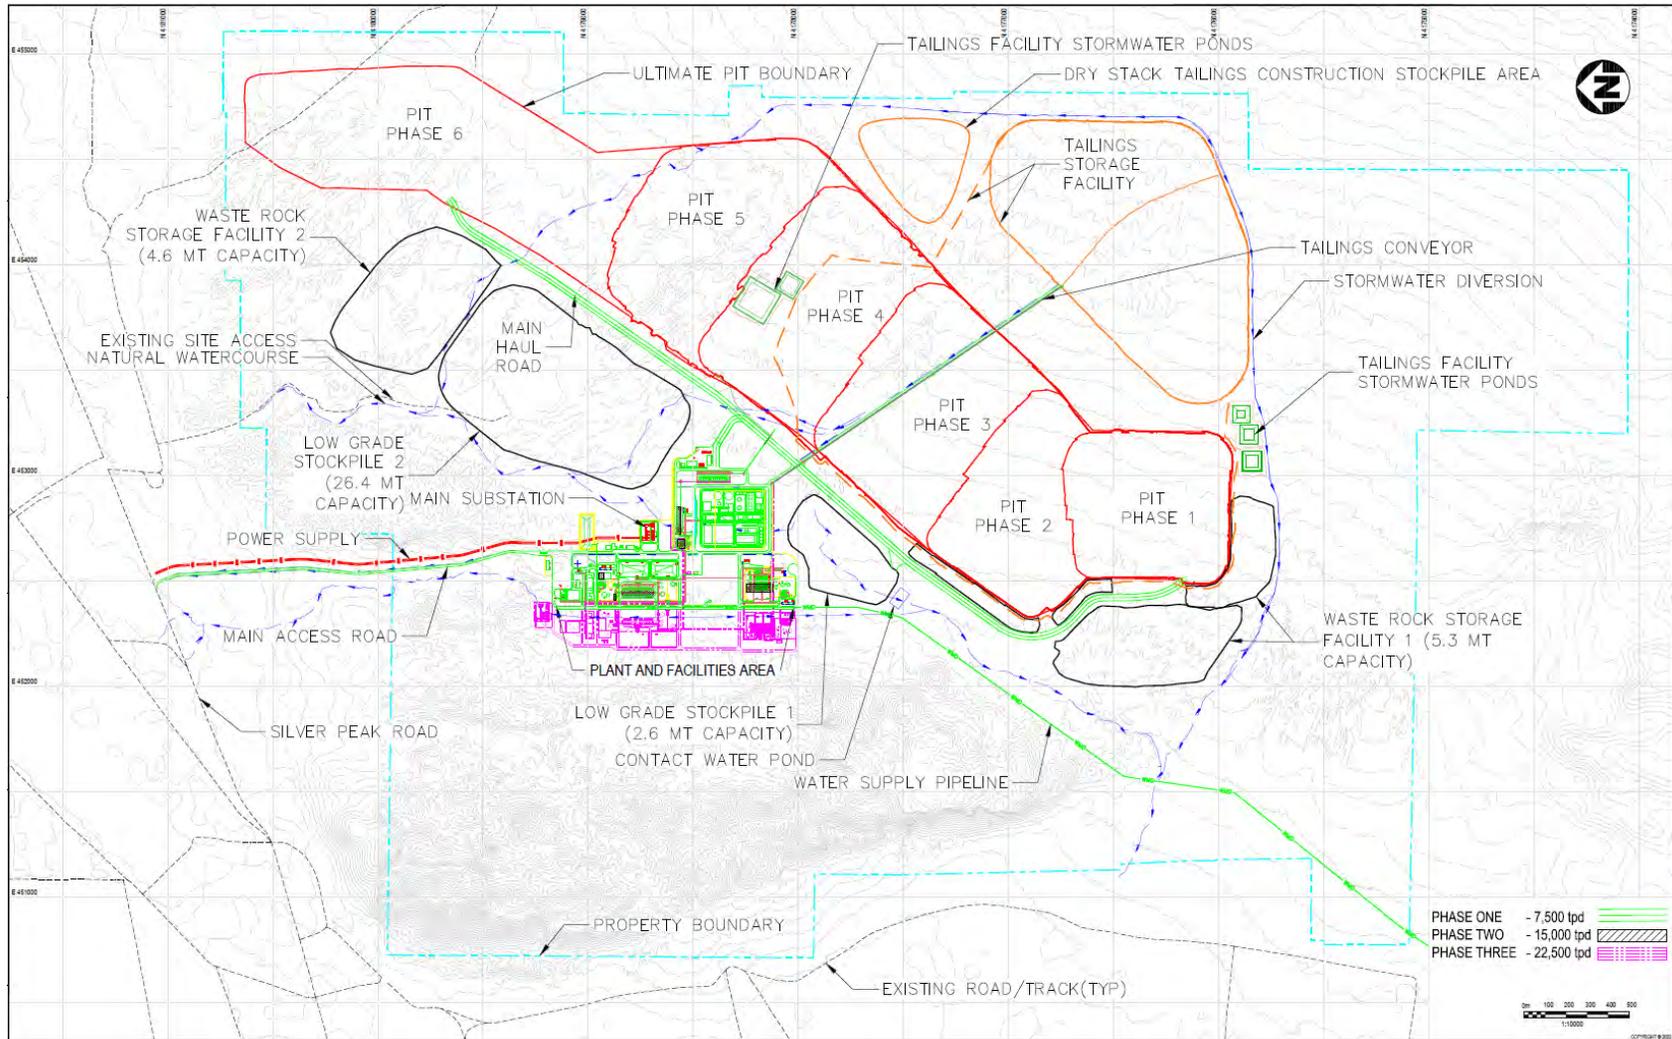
Overall Site Plan (Source: Wood, 2024)
